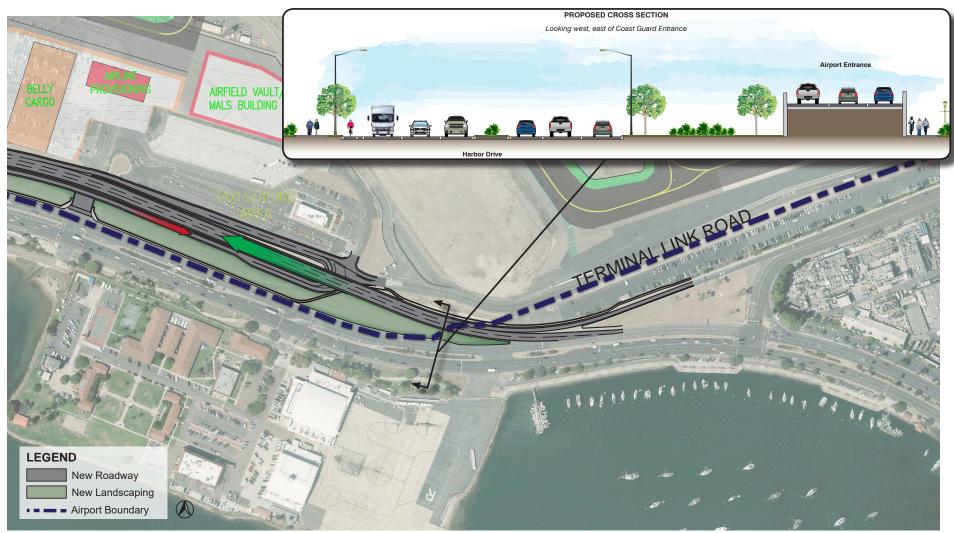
On-Airport Entry Road and Harbor Drive Cross Section
